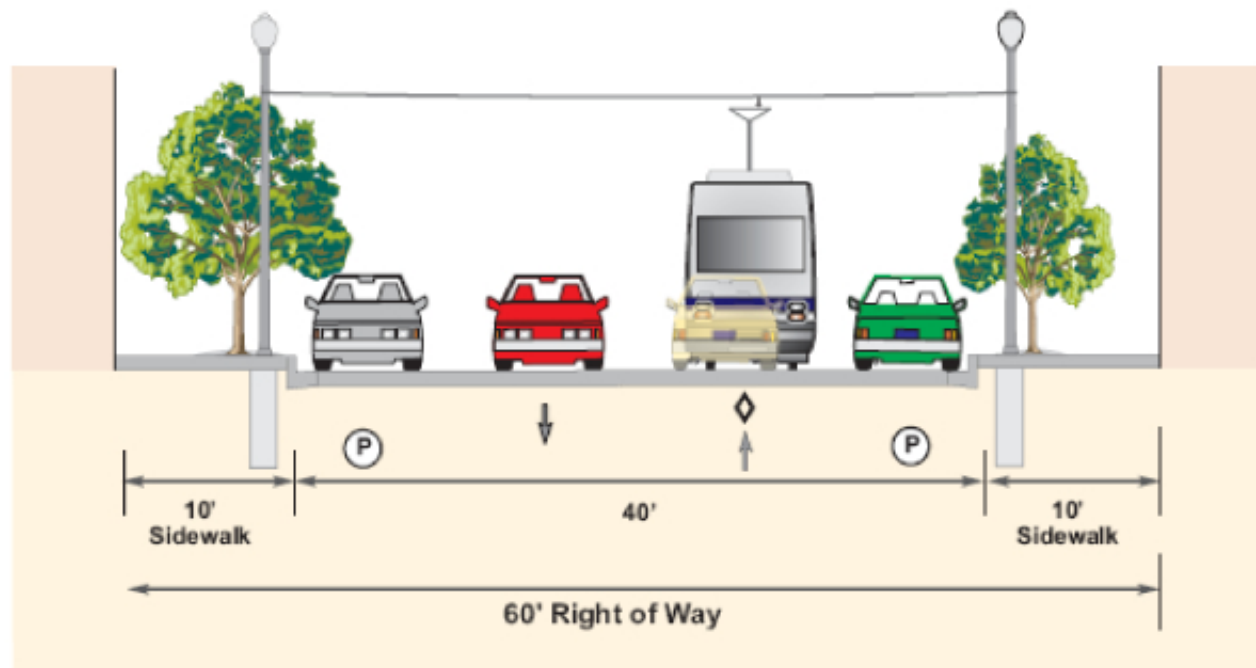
Typical Section – Uptown Whittier Streetcar Loop
